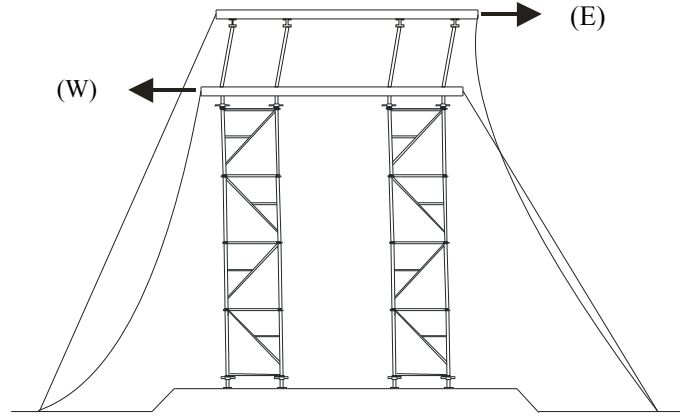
Buckling Failure of Outdoor Heavy-duty Scaffold System with Shores under Loading
